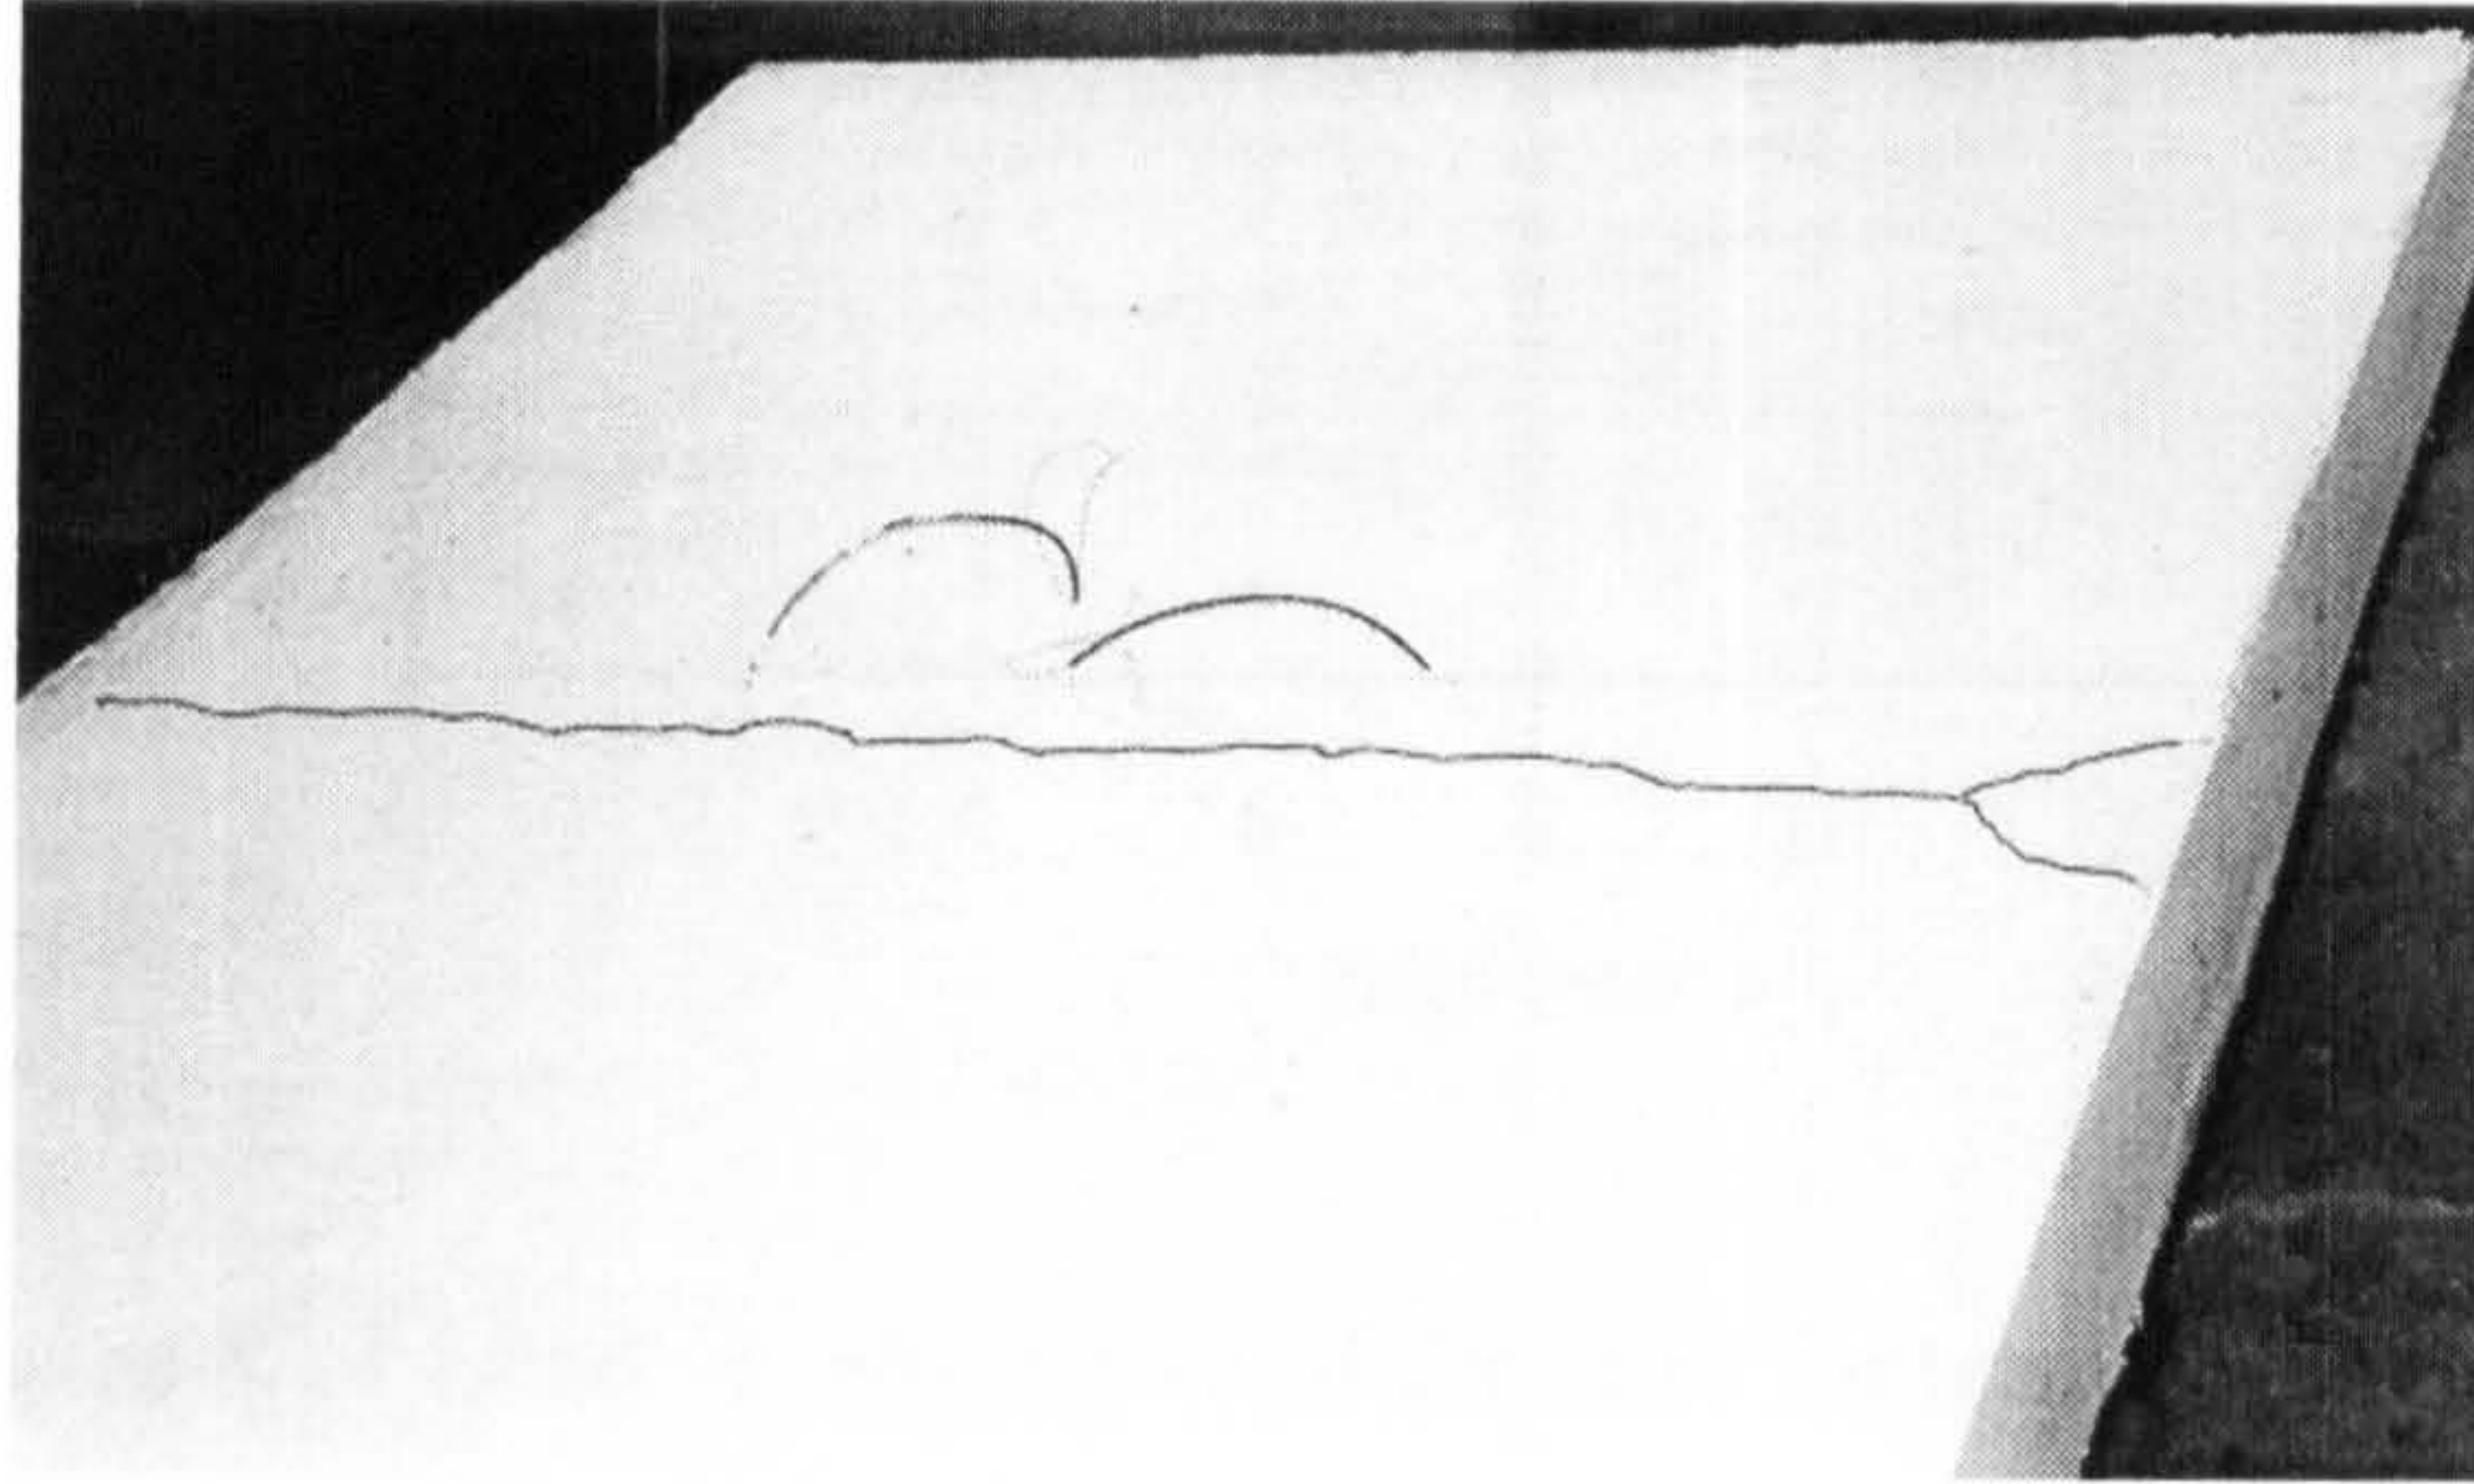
Cracks at middle upper surface of concrete slab for test specimen S3
